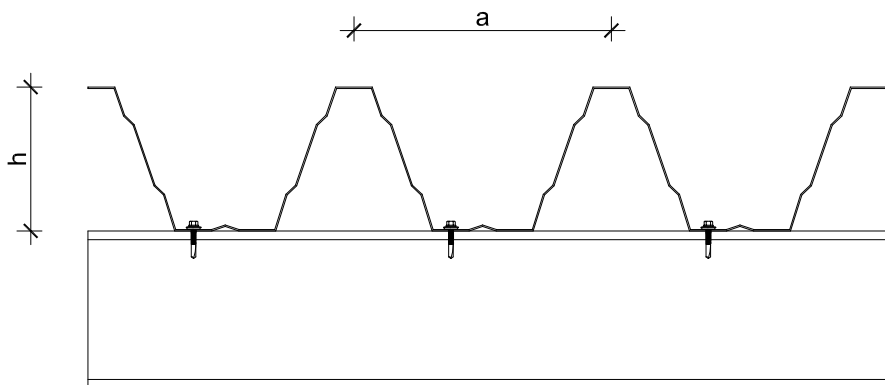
Example of a fastener layout. Non-insulated roof (NEGATIVE steel placement).
